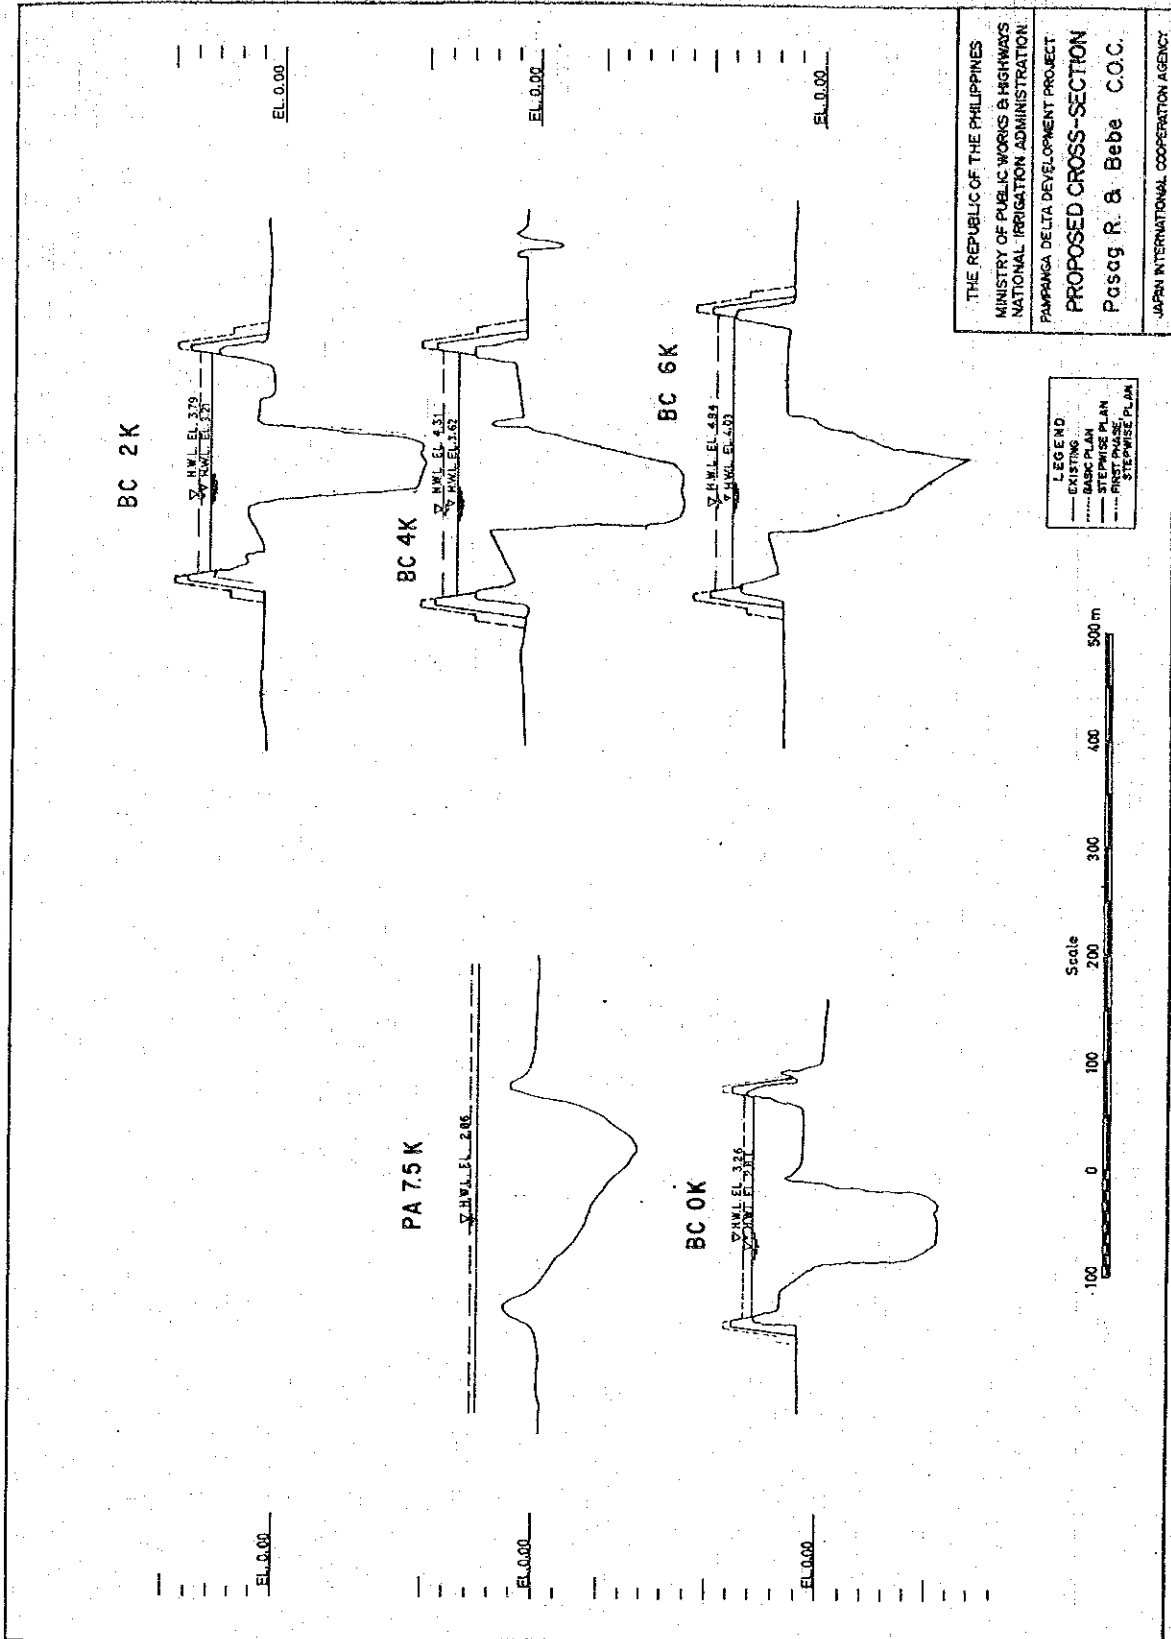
(13) PROPOSED CHANNEL CROSS-SECTION
